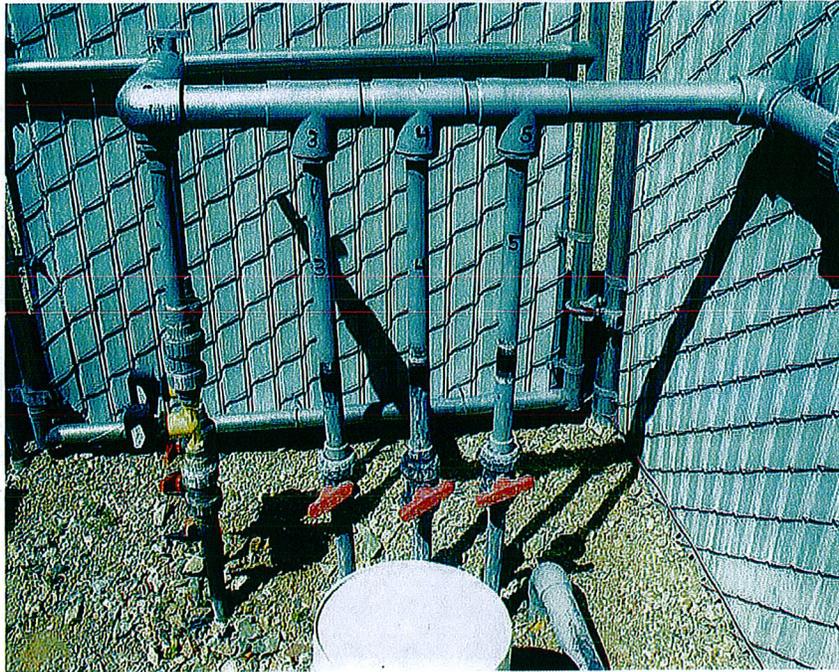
View looking at P&T system manifold piping from EW-1, EW-2, EW-3, EW-4, and EW-5.
